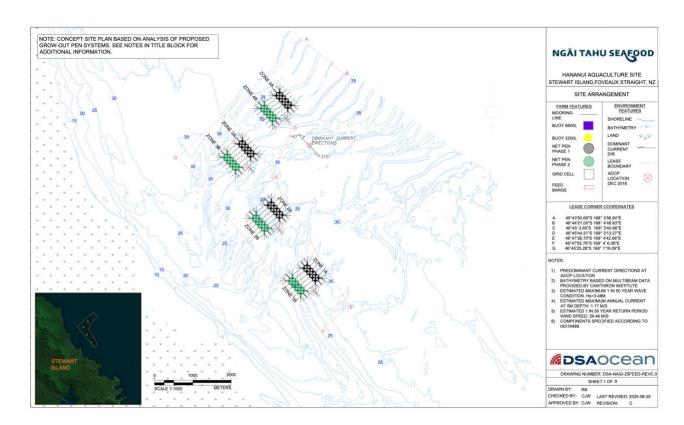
Preliminary site plan showing the proposed salmon farms and mooring lines (cite)
